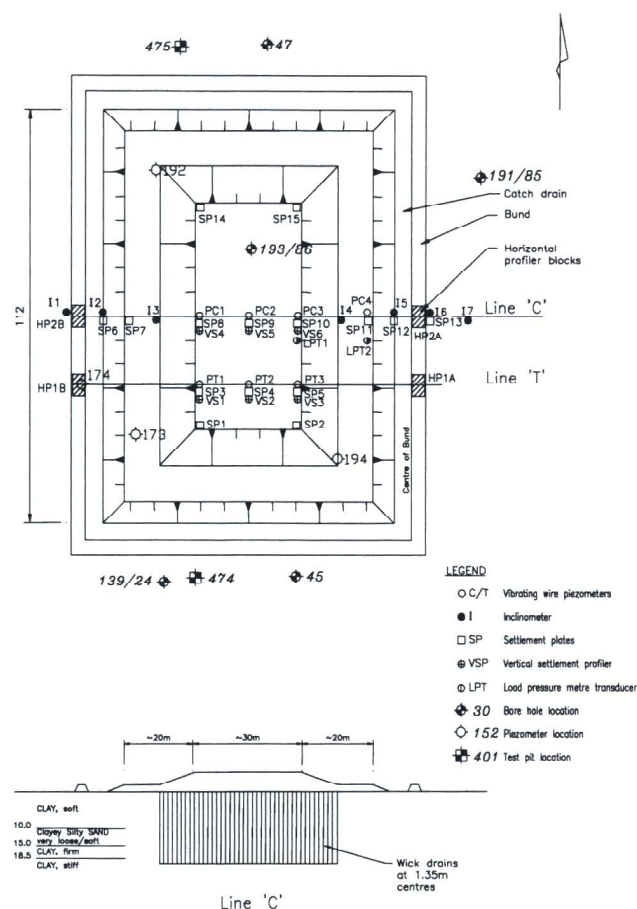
Cumbalum Trial Embankment Plan and Cross Section
